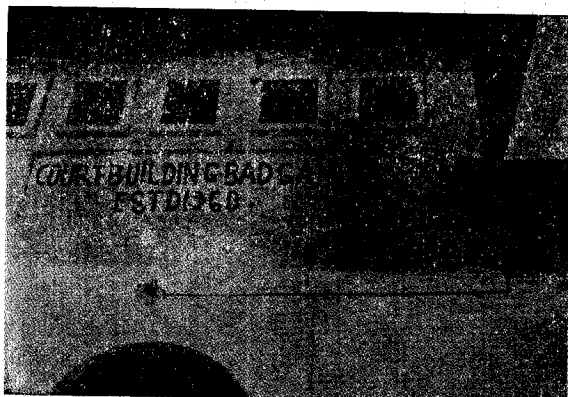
(a)—Court Building, at Badgam with crack in Pont wall.
